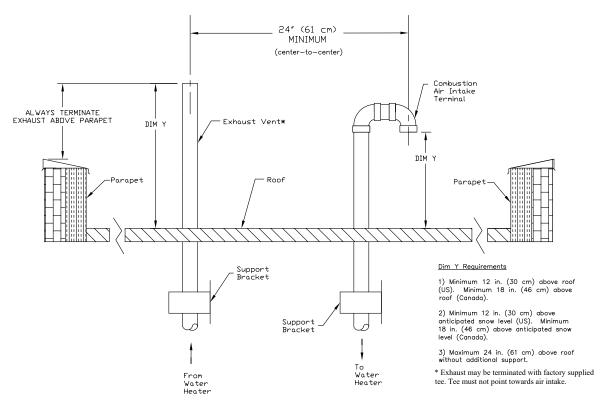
Flat Roof - Vertical Venting, 2-pipe termination
